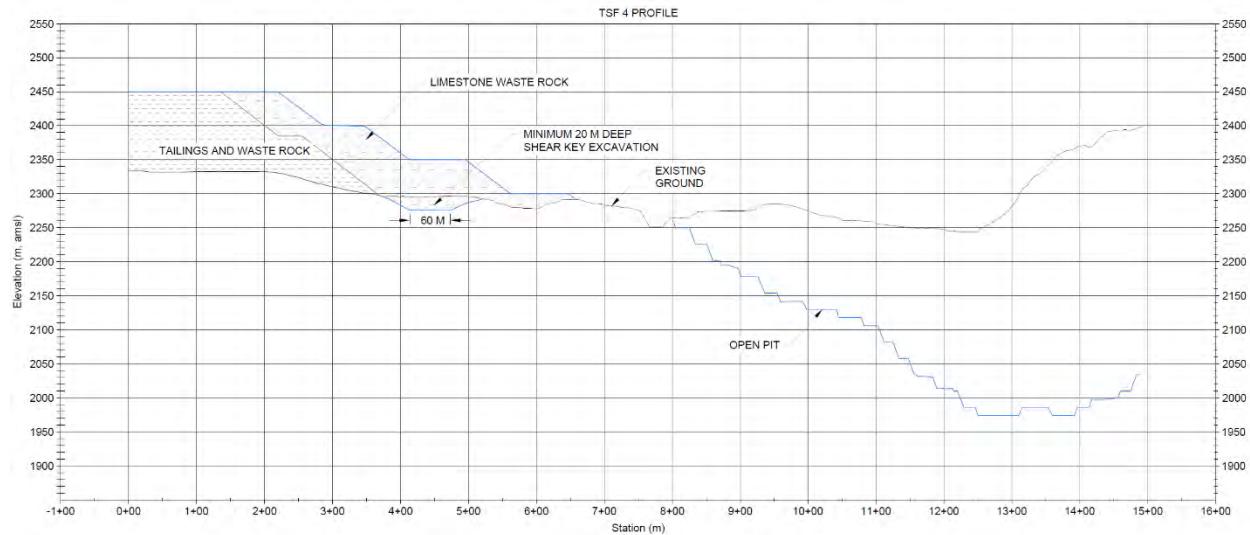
West Tailings and Rock Storage Facility Southern Portion Cross Section - LOM
